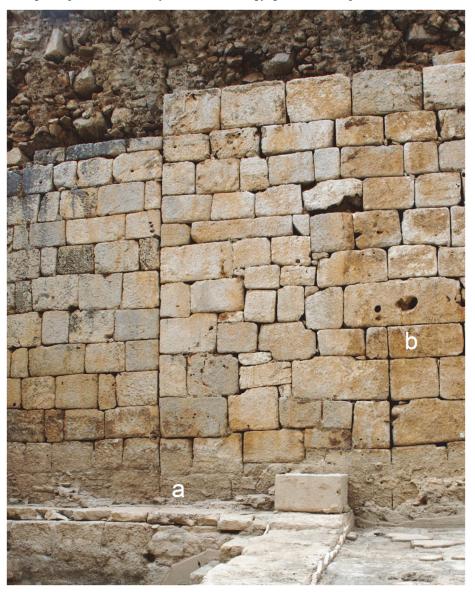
Joint on the east wall of the frigidarium, a: joint, b: later closed door (@Patara Excavations)
